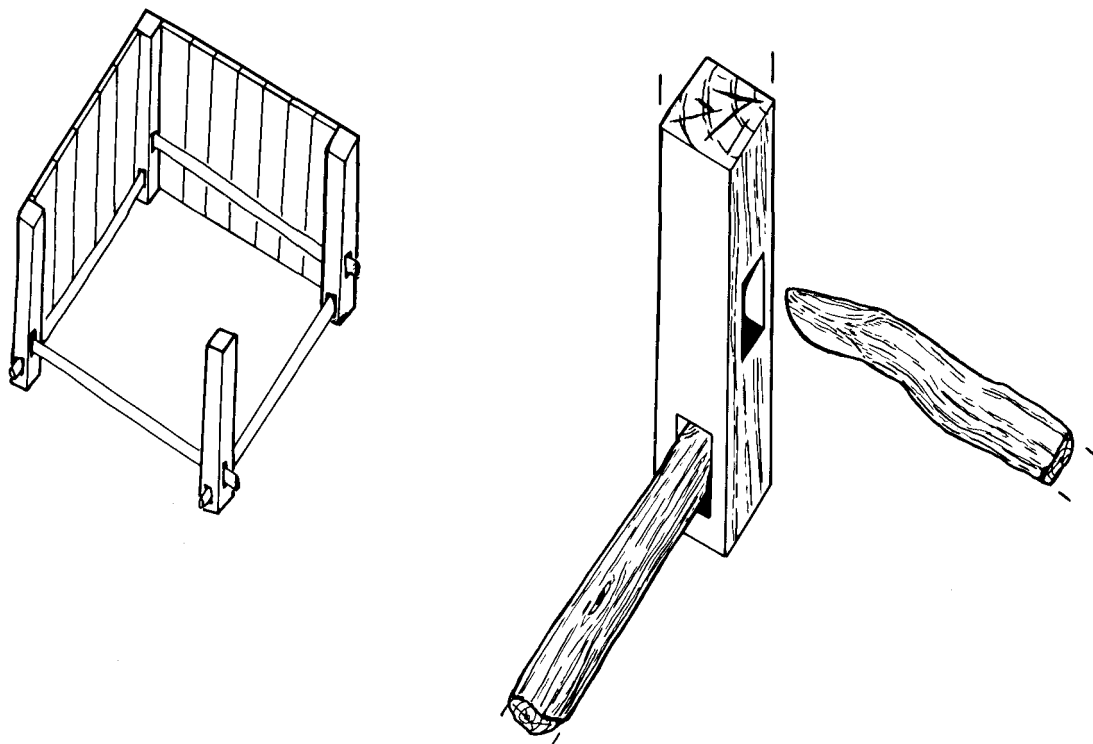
Queen Street 1953 & 1960: Construction of Well 24, showing mortice and tenon joint on corner posts.
